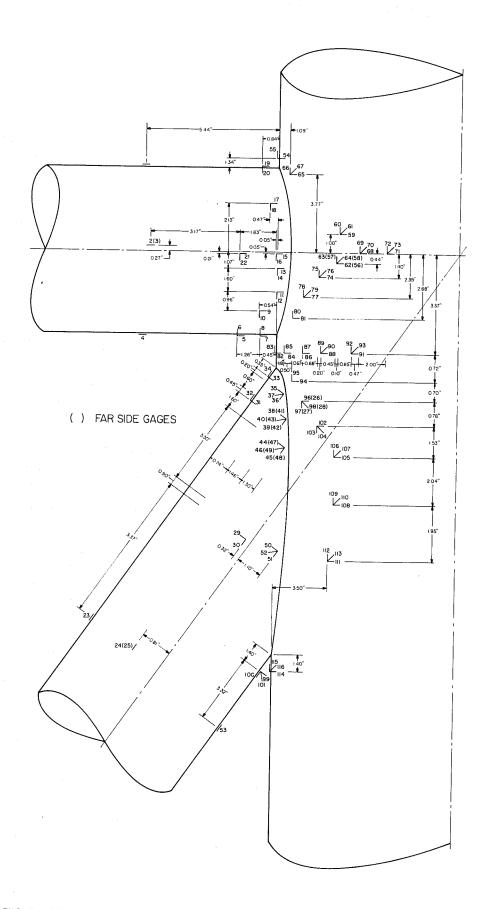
STRAIN GAGE LOCATIONS ON TYPE I JOINT, PHASE II PART I SPECIMEN
